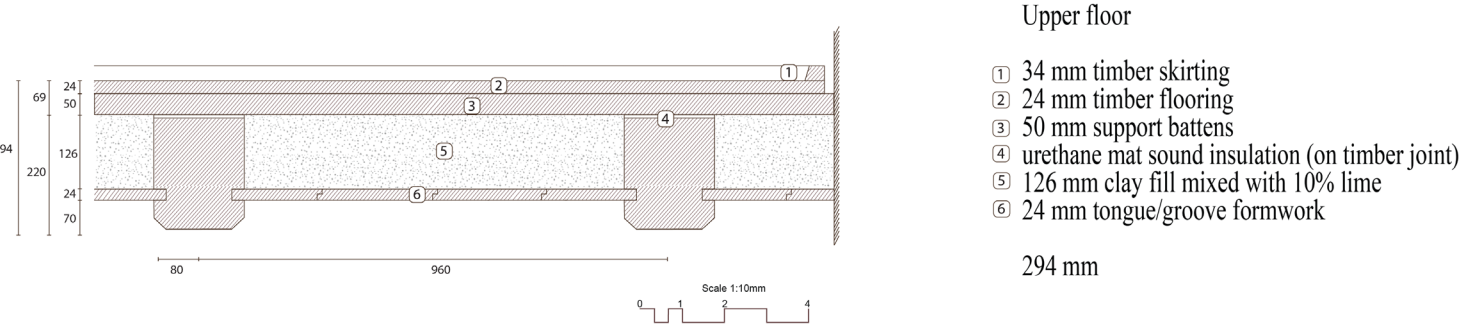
Upper floor detail (joists, clay-lime fill) - Scale 1:100 (Author's drawing)
